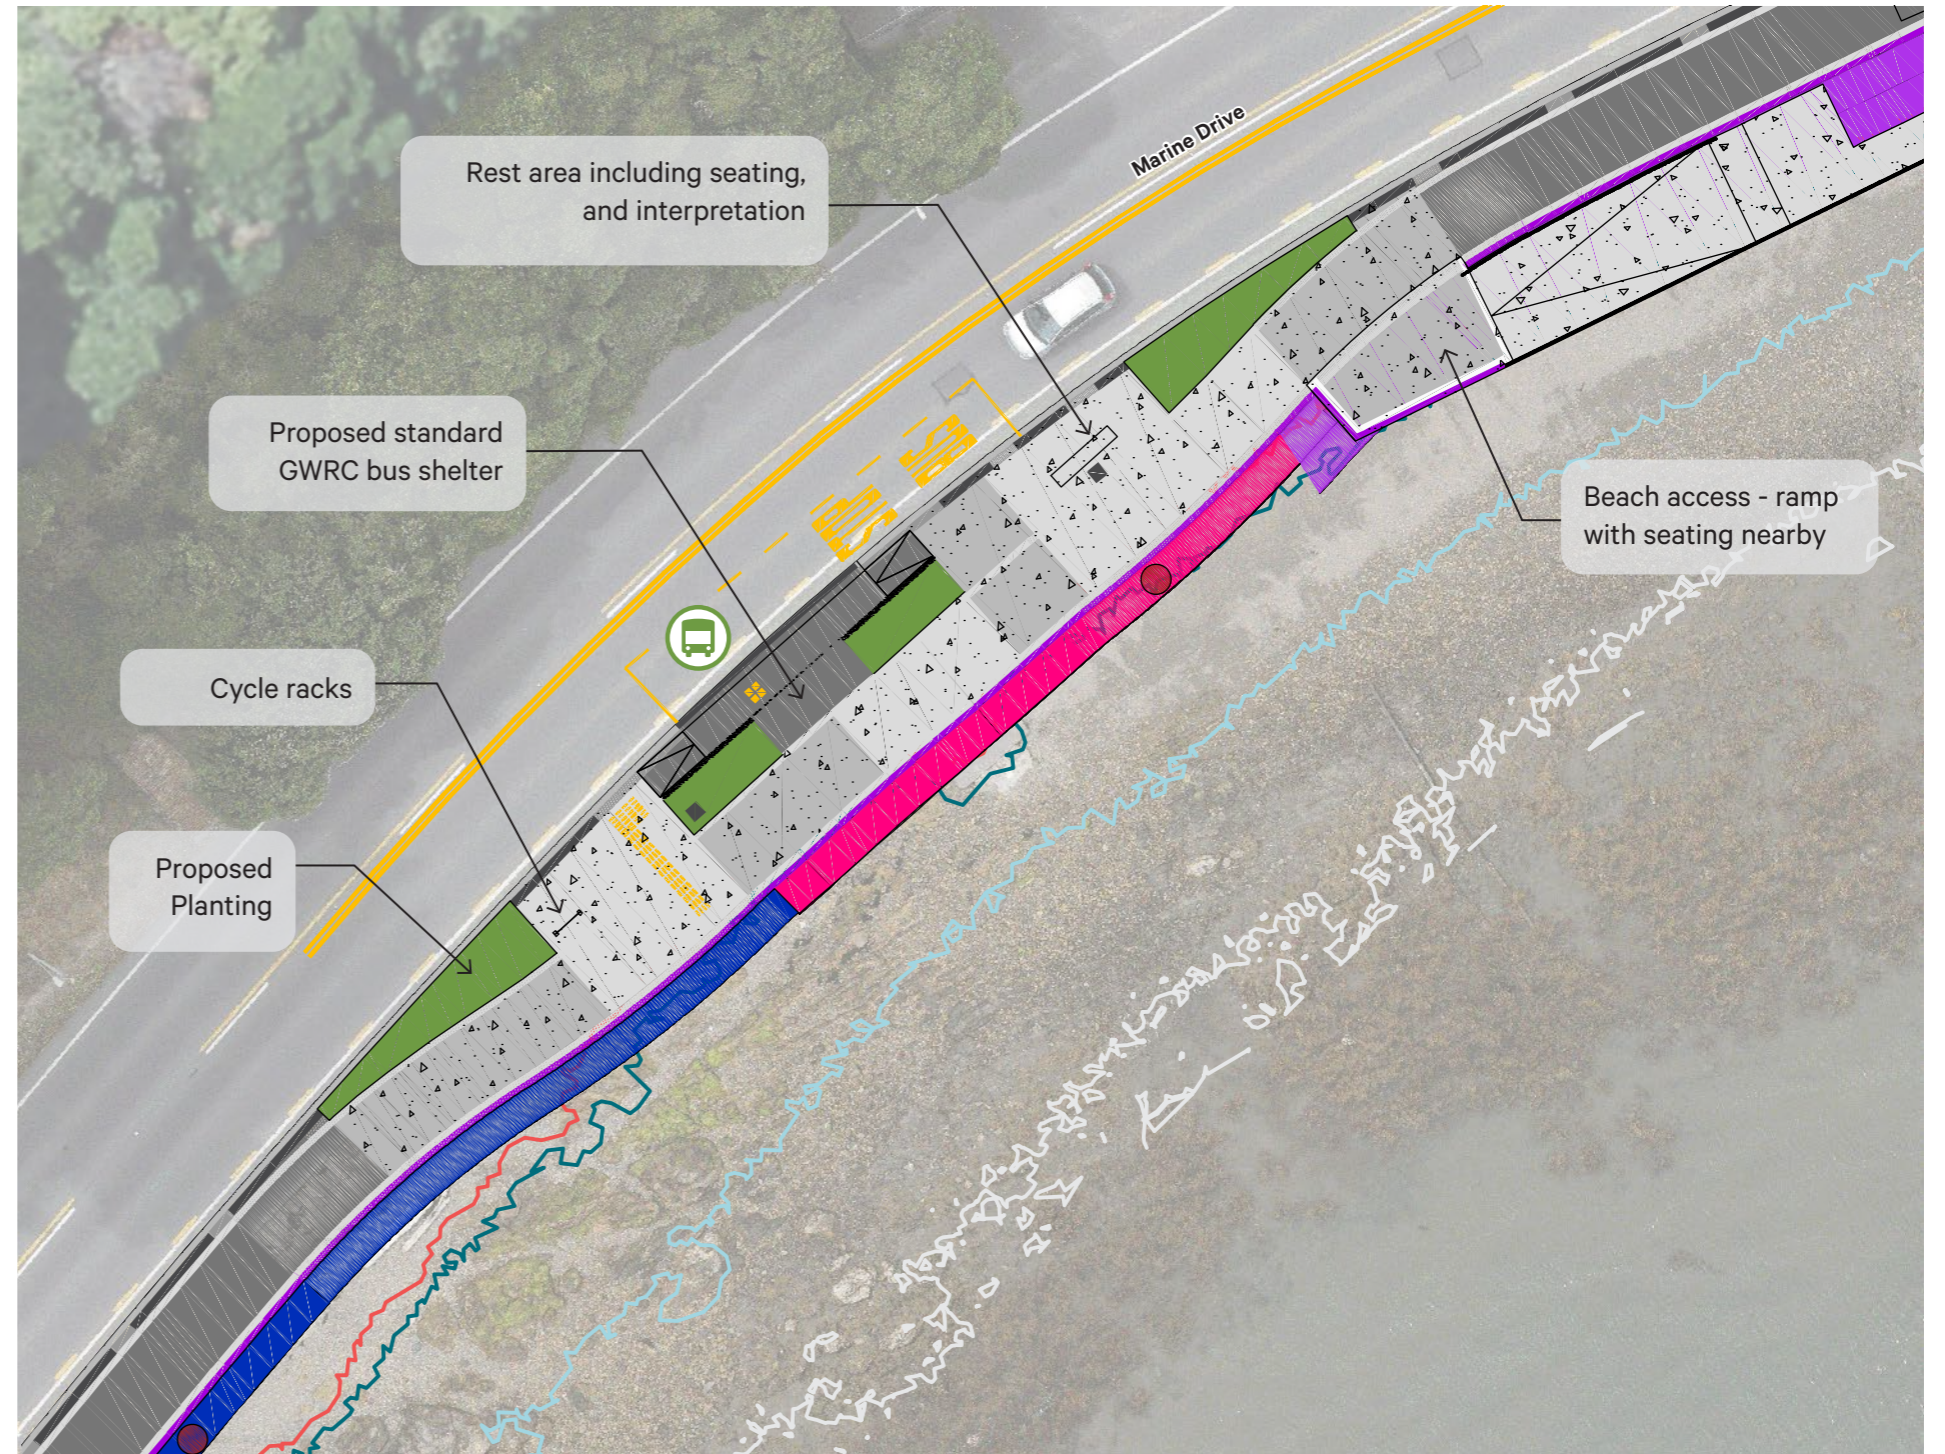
Proposed openspace arrangement at Mahina Bay bus stop.
